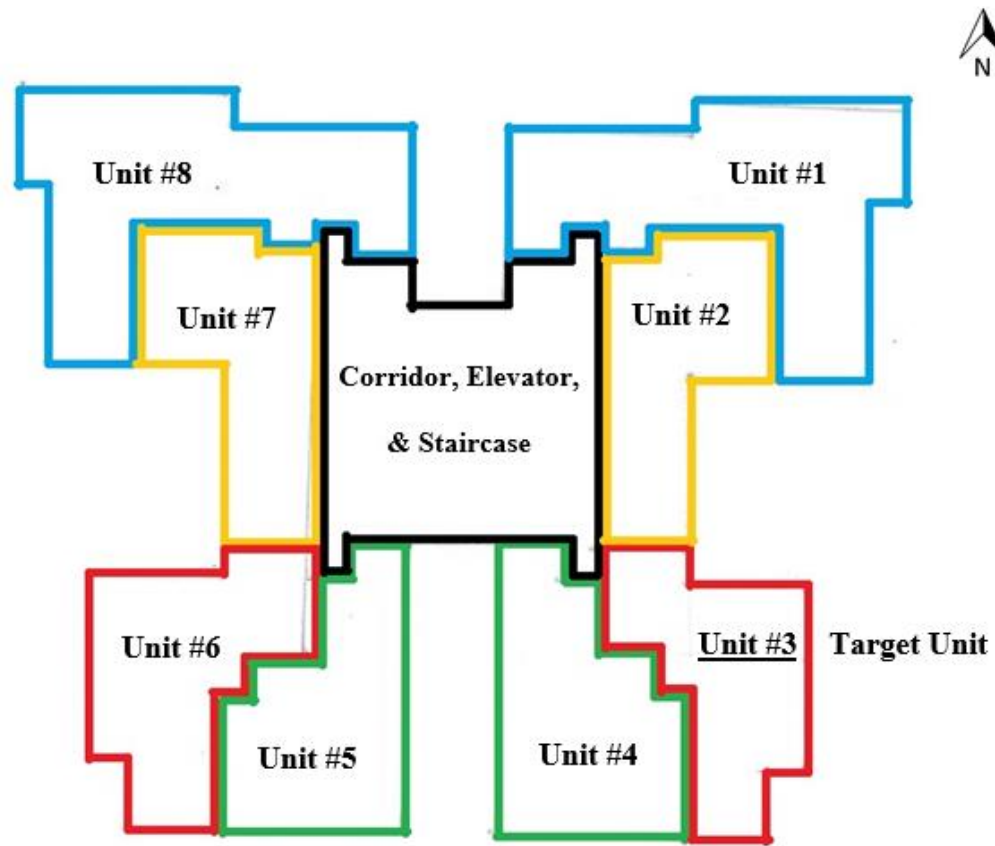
The Case-Study Building Floor Plan. There are 8 units on each floor. The layout of the units are symmetric on a north-south central axis. The case-study apartment is located on the south east of the 8th floor.
